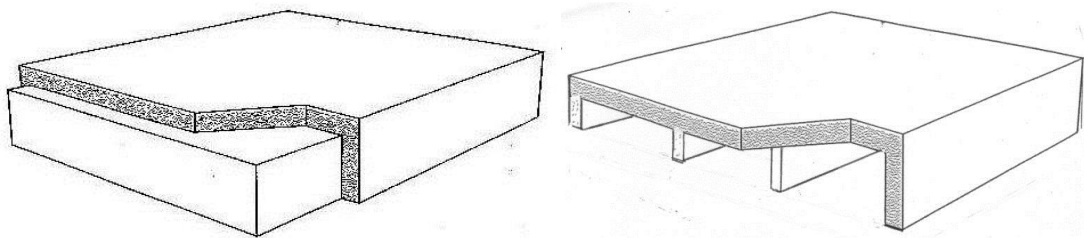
The left figure represents a method where the polystyrene blocks are installed first and concrete can be poured afterwards. The right figure illustrates structure with additional ribs. The building process is predominantly executed near to the water in a dock or on rail construction after which the structure can be launched into the water.
